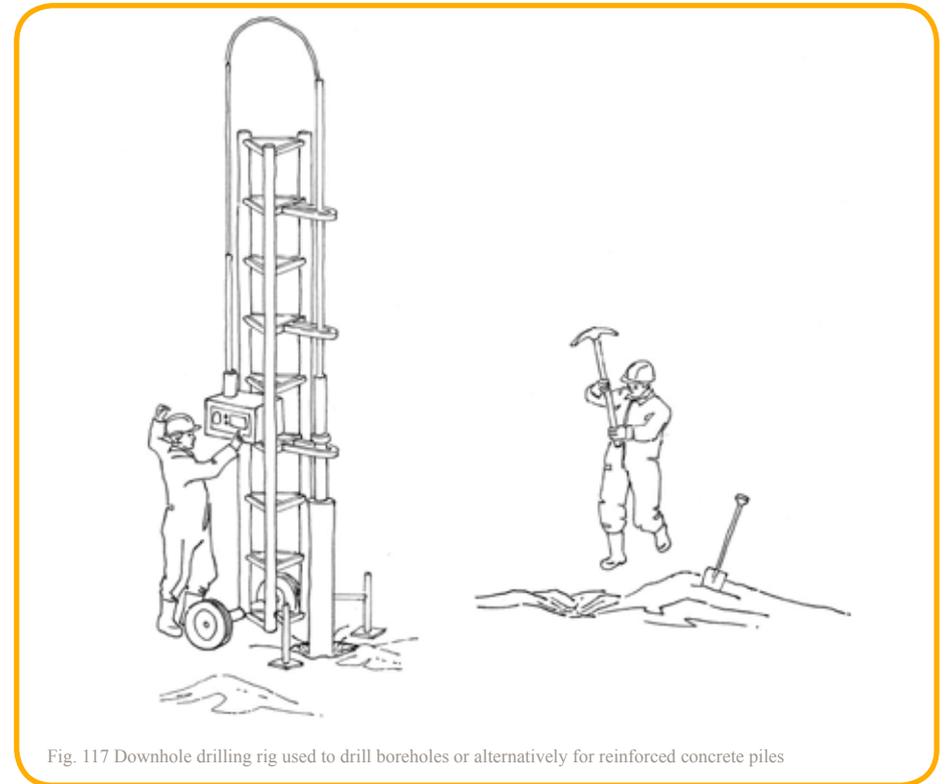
Downhole drilling rig used to drill boreholes or alternatively for reinforced concrete piles
